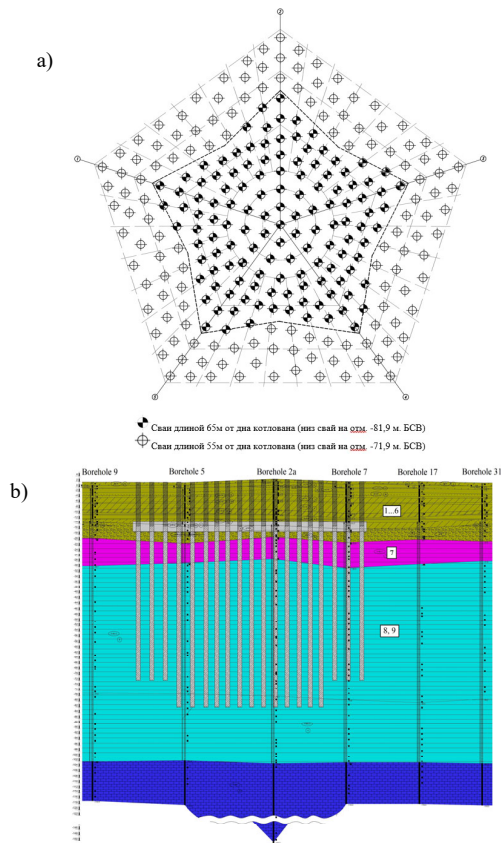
Layout of bored piles (a) and cross-section with the bored piles (b): XX - piles length of 65 m (the elevation of the pile end is 81.9 m) (Sharafutdinov et al, 2024)
